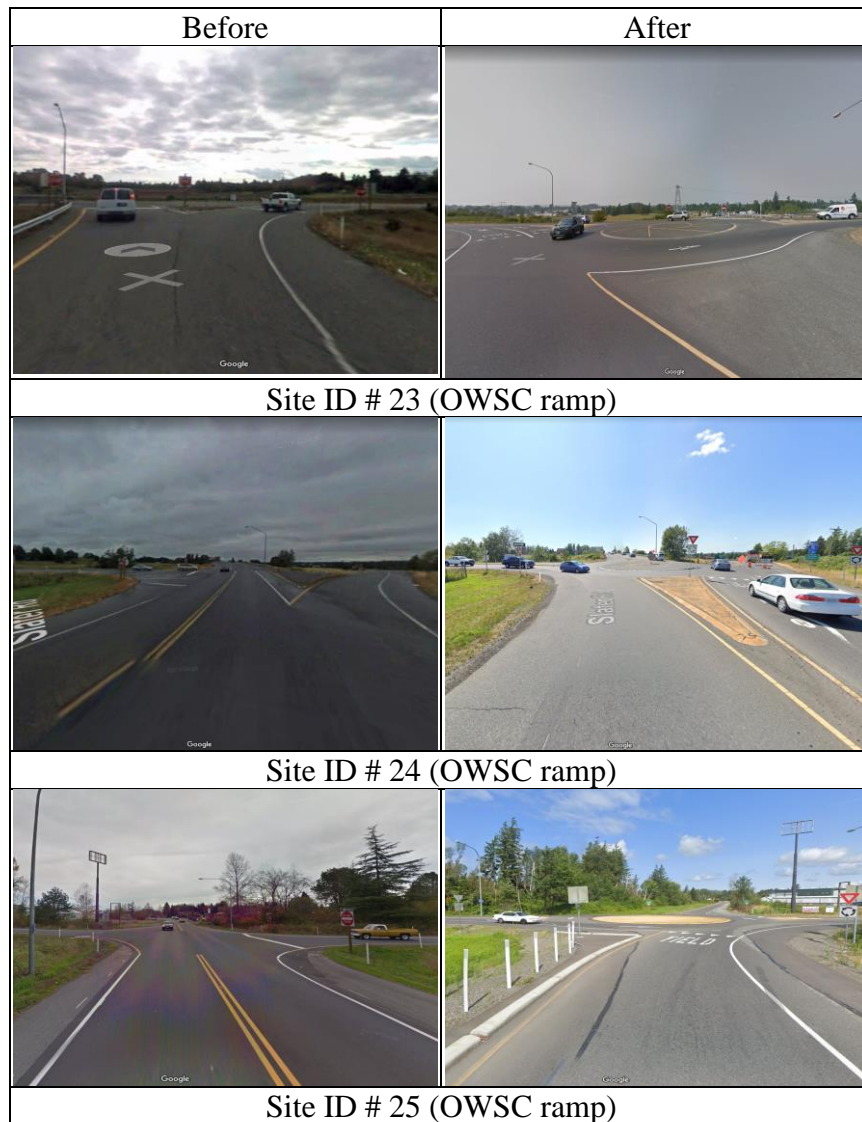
Before and after pictures of TWSC/OWSC intersections converted to mini-roundabouts (© Google street view).
